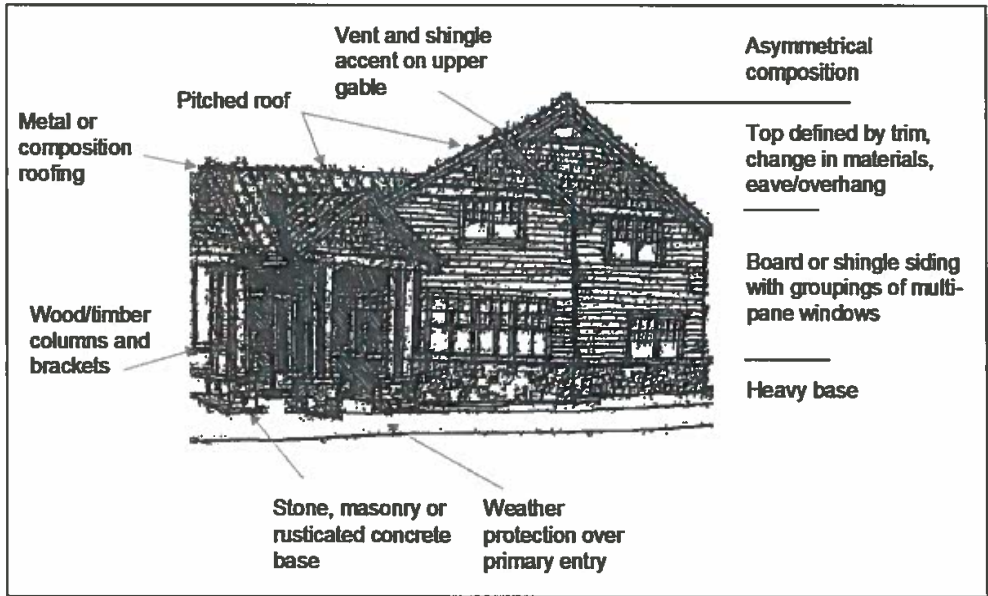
G: Typical Building Elements in Sandy Style (Commercial Building)
